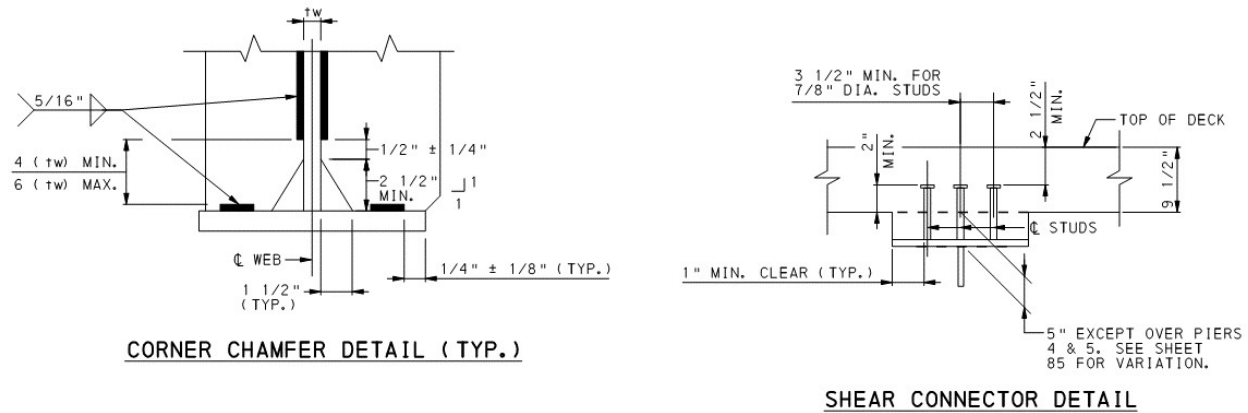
Common web-to-flange, connection plate, and shear stud welds.
